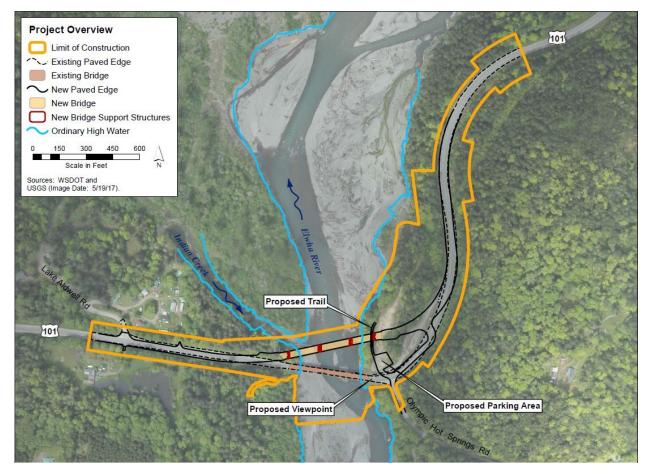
Project overview, showing proposed parking area, viewpoint, and trail.
